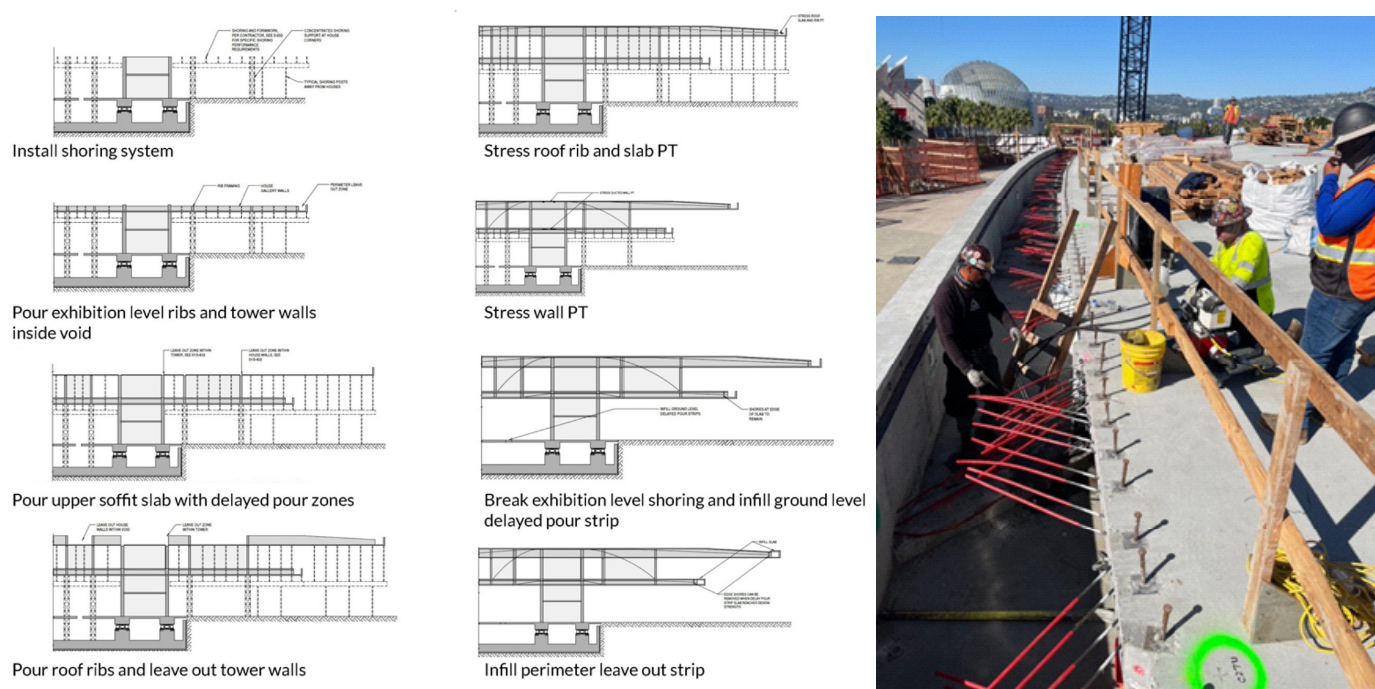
Construction sequence (left) and leave out at building perimeter (right).
